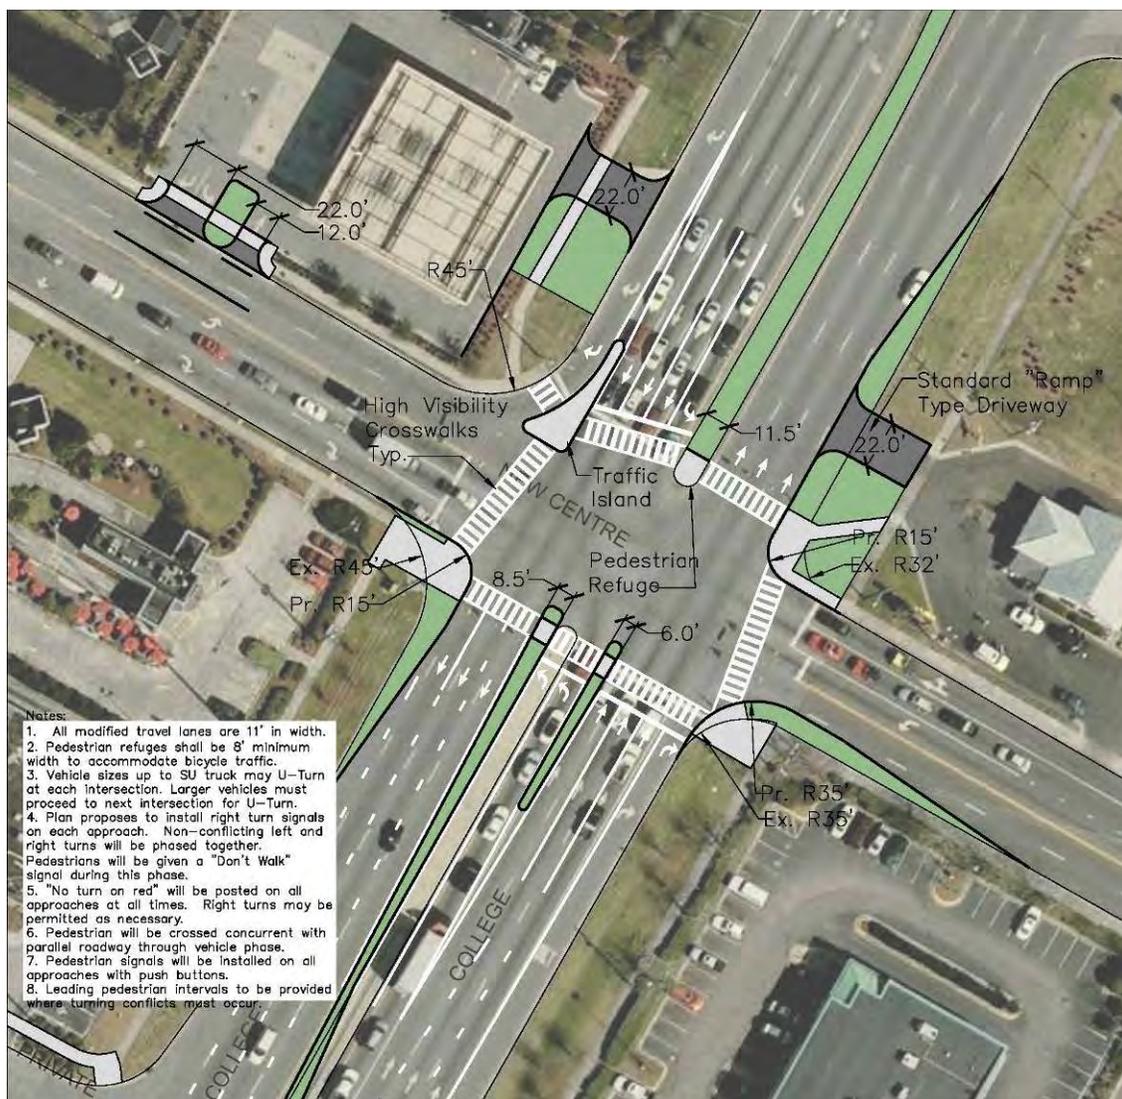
Conceptual redesign of intersection to shorten crossing distances and recapture unnecessary roadway space to provide pedestrian accommodations.
